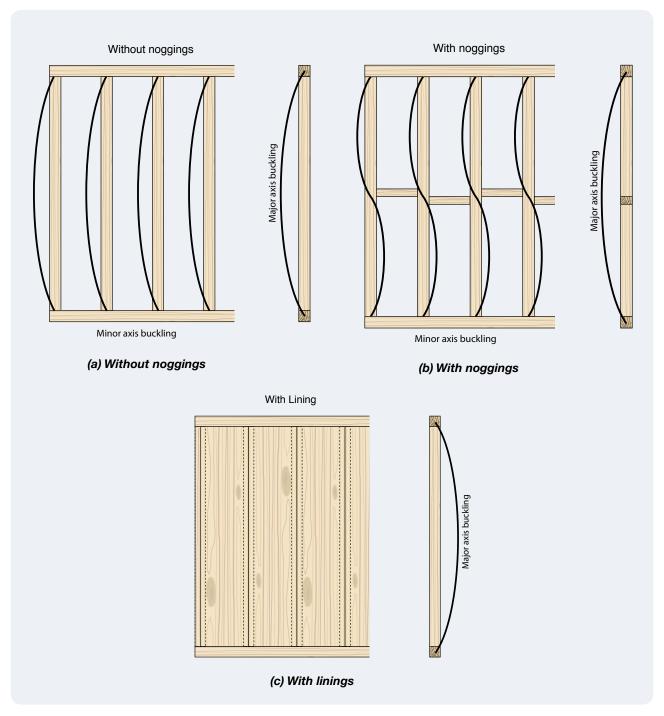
Buckling of studs in lightweight timber wall frames.
